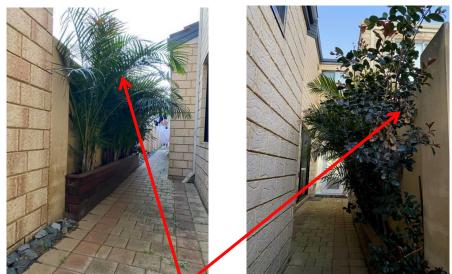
Image depicting 3.4m of exposed boundary wall facing the adjoining northern property.
